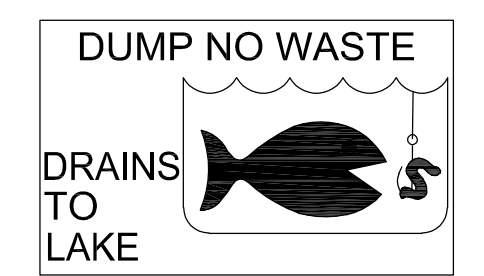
PLATE SHALL BE ADDED TO STORMWATER INLETS AS REQUIRED BY THE CITY.
